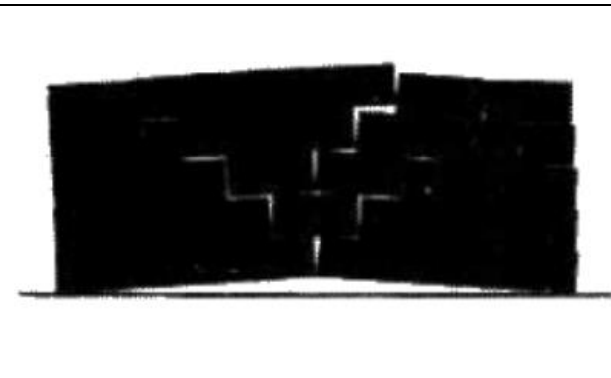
Wall Undergoing Hogging Strain Stage 3¹
